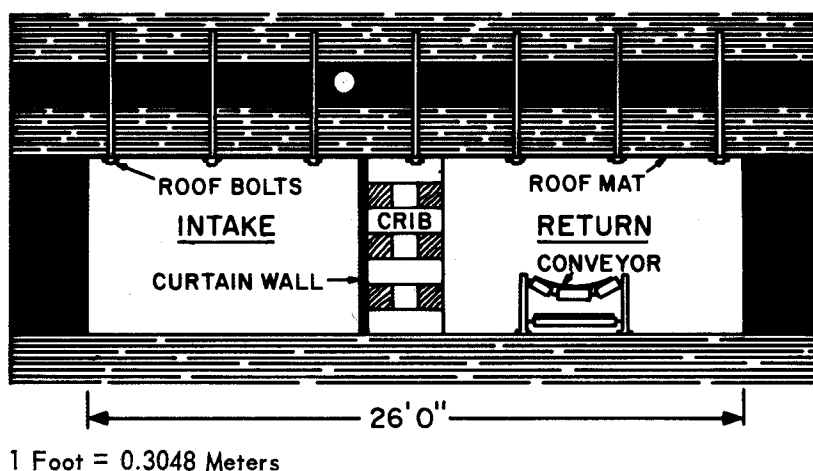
END VIEW OF THE SINGLE ENTRY LONGWALL DEVELOPMENT,
